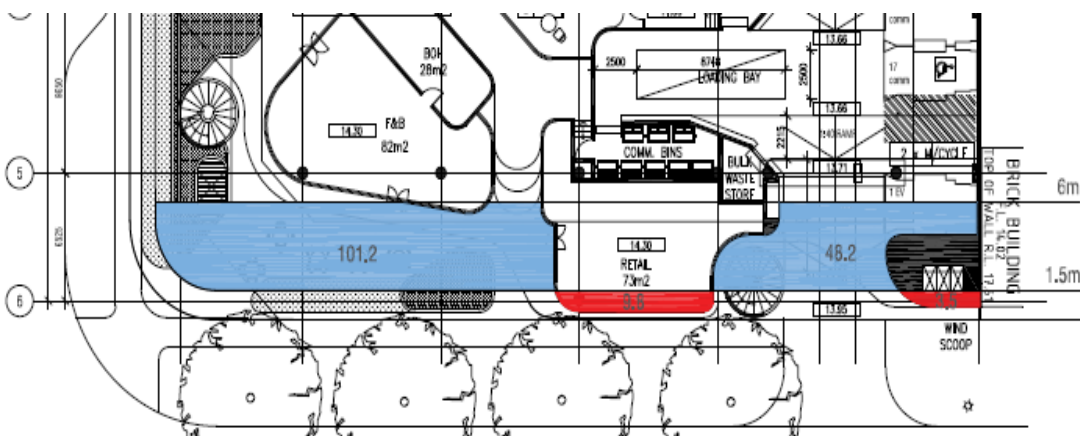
Kishorn Road (Ground Floor) Setback Encroachments in Red and open (compensating) area in Blue at 6m setback
